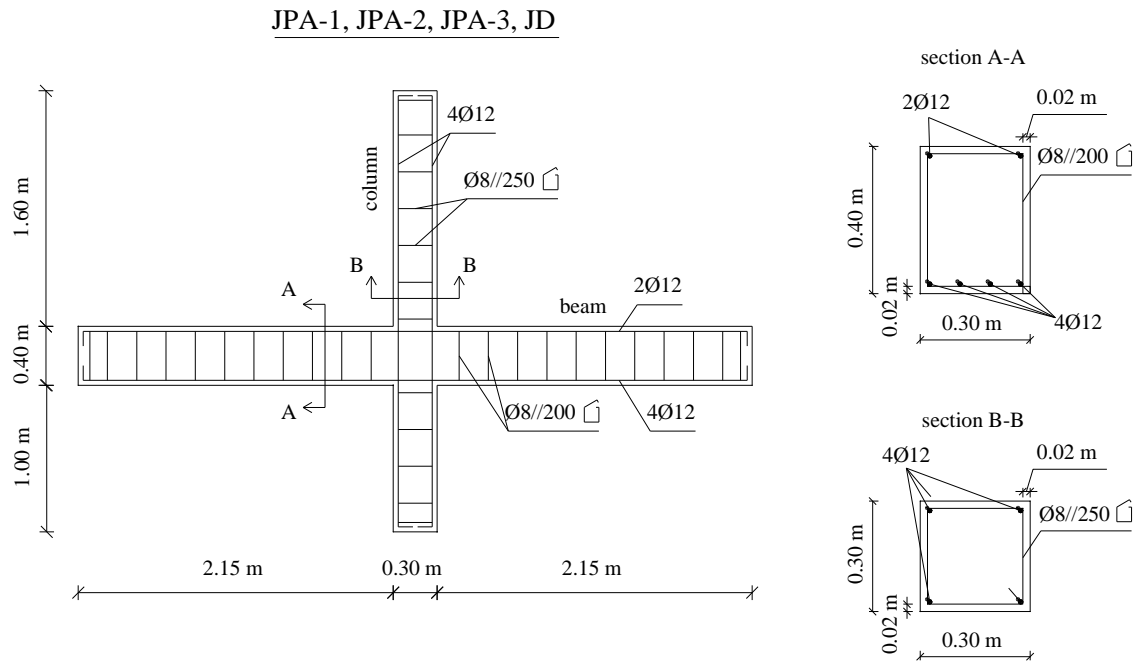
Dimensions and reinforcement detailing of specimens JPA-1, JPA-2, JPA-3, and JD.
